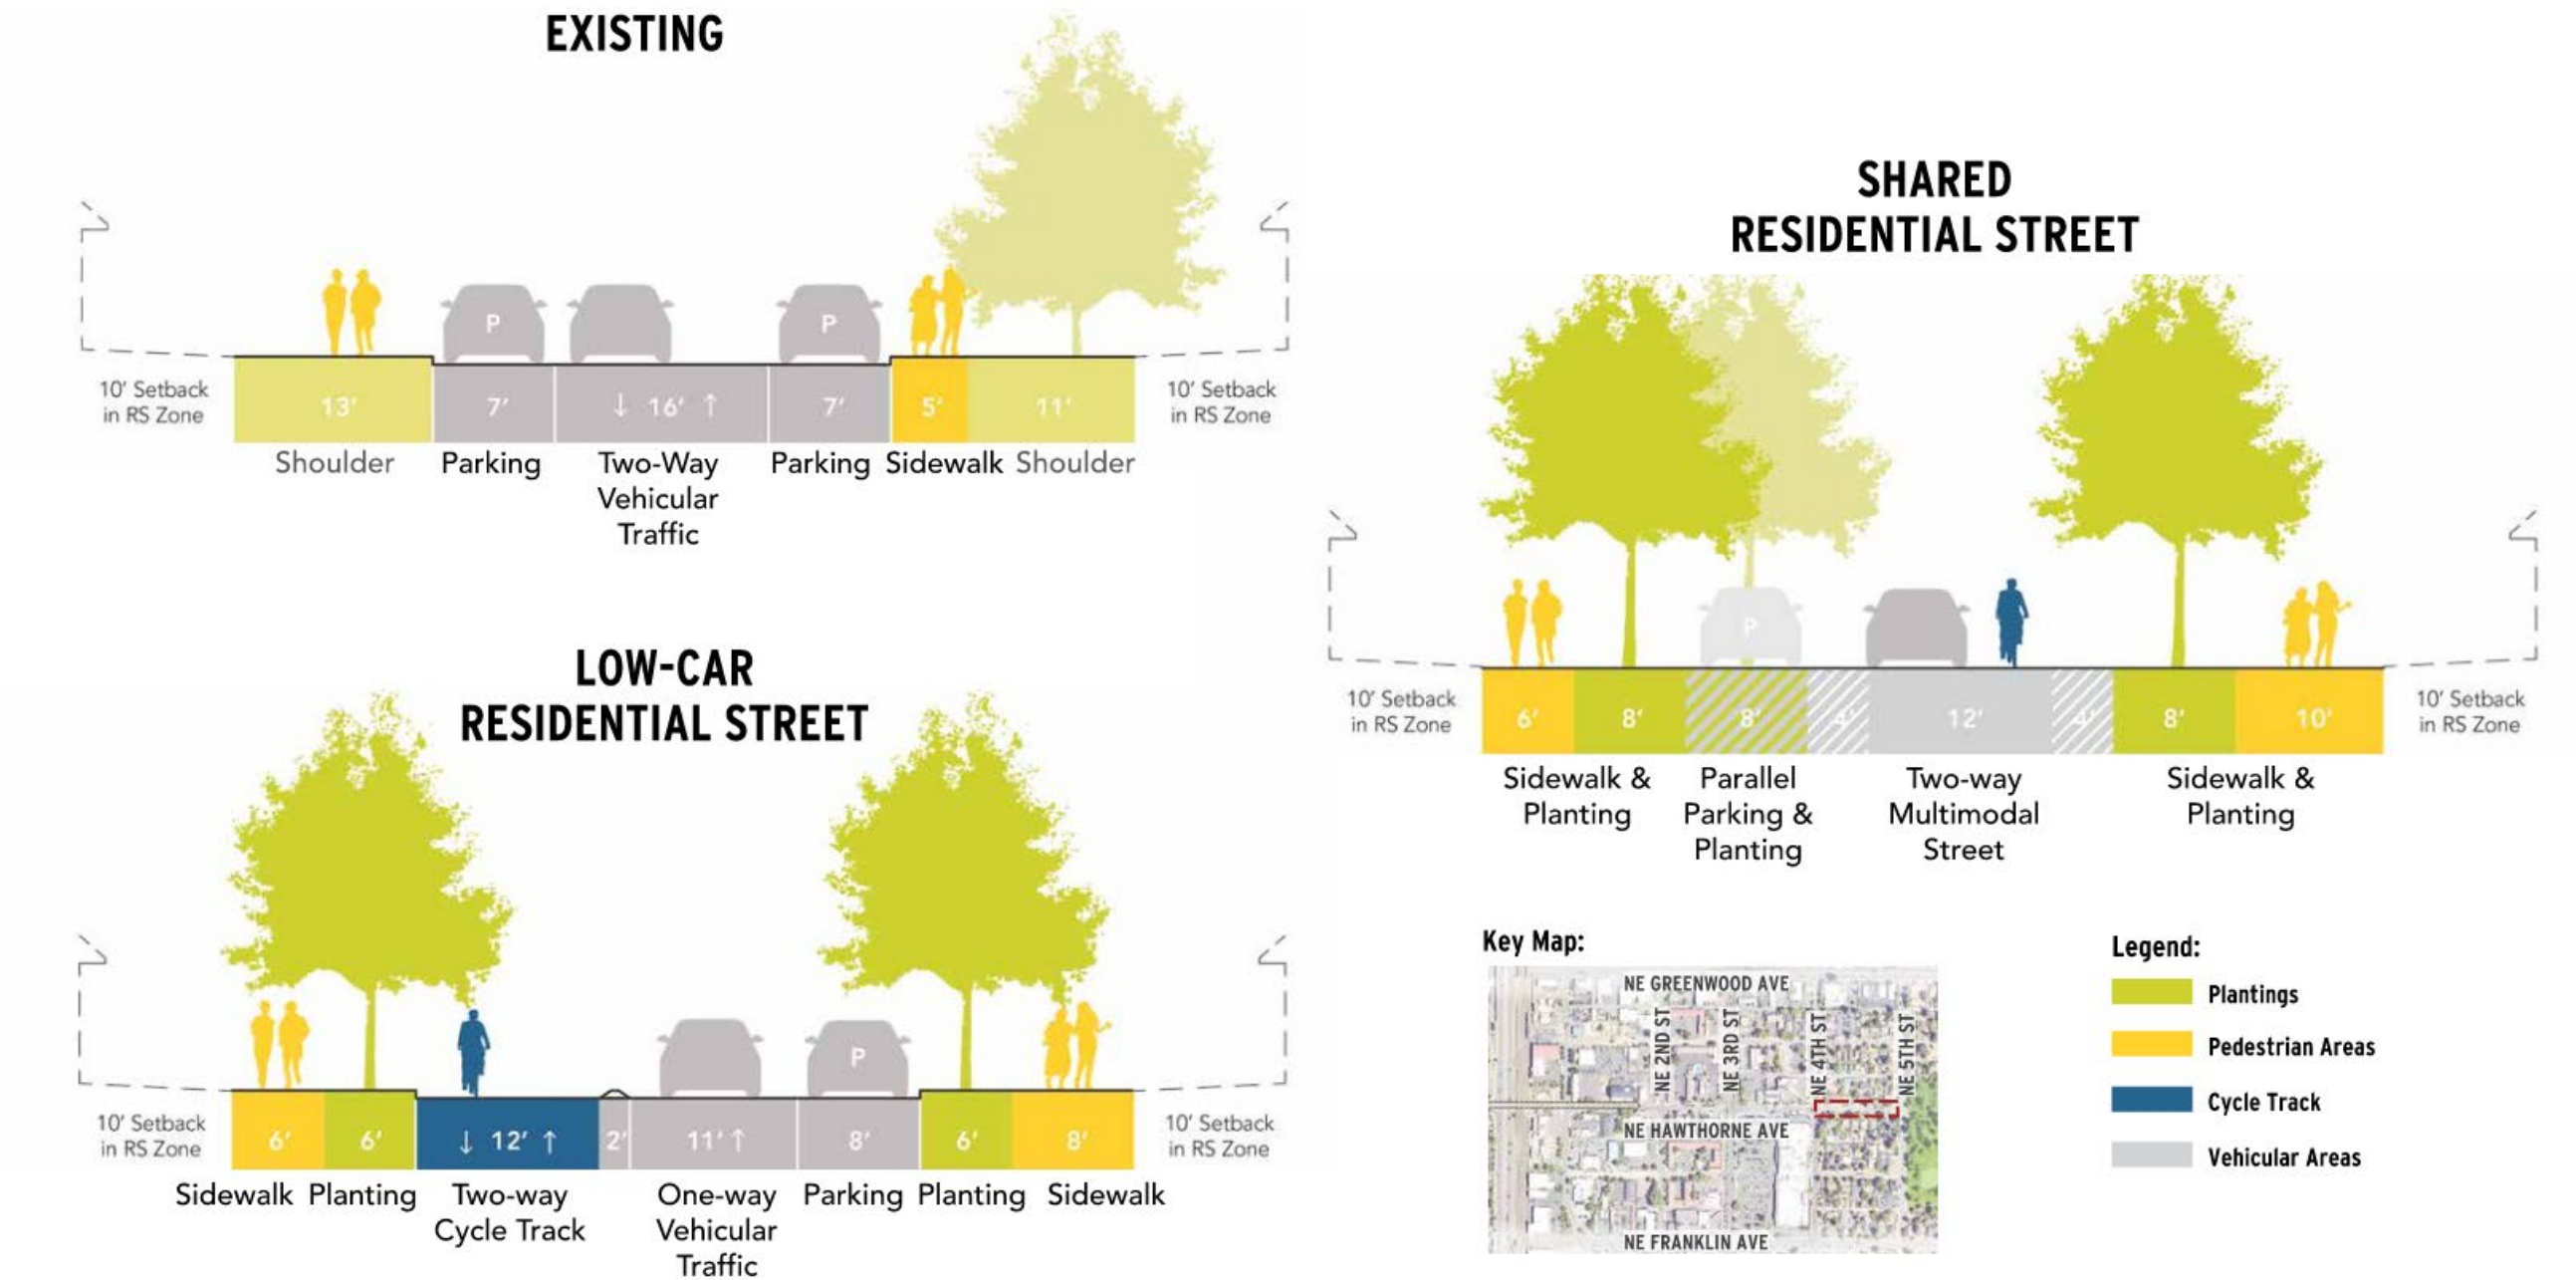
EXAMPLE CROSS SECTION IDEAS – BETWEEN 4TH STREET AND 5TH STREET
